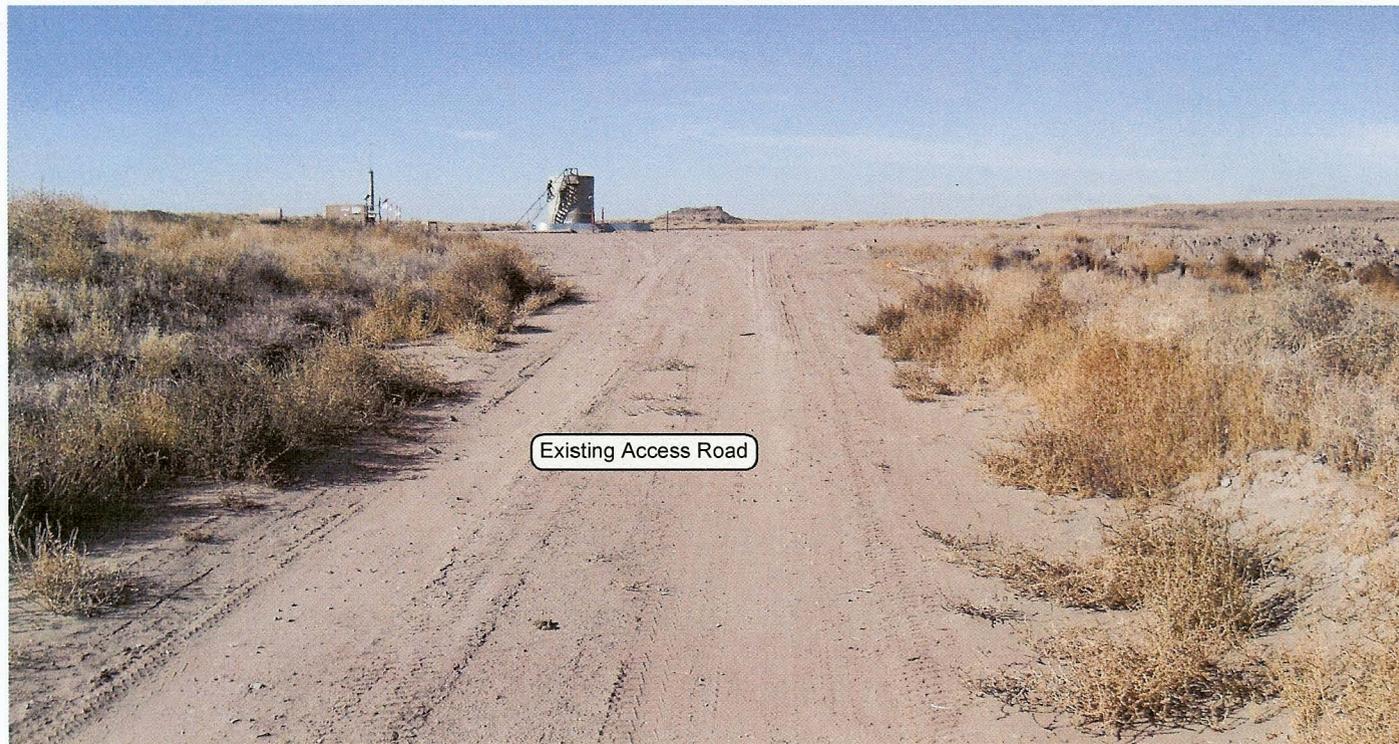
PHOTO VIEW: FROM EXISTING ROAD CAMERA ANGLE: WESTERLY
